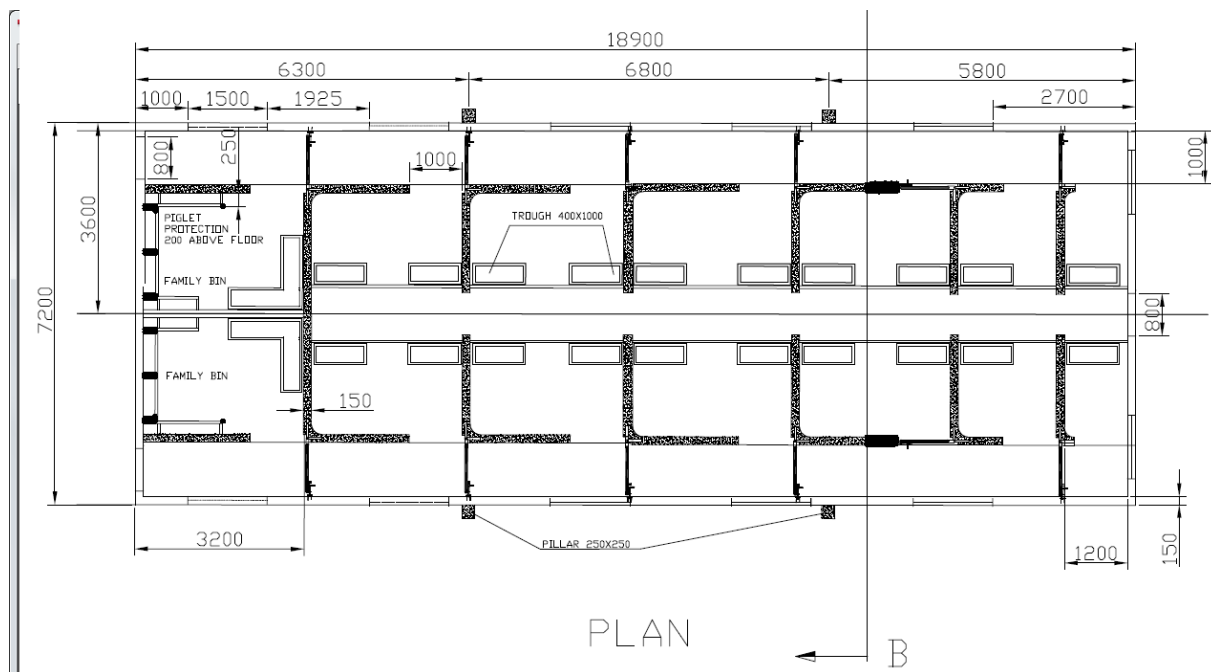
Floor plan of pigsty at Katulani SS[39].
